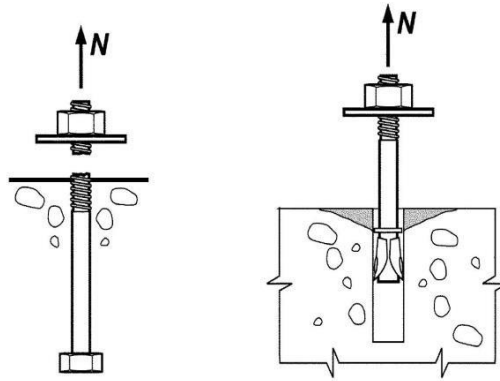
Tensile Failure Type i) Steel Failure, ii) Pull-out
